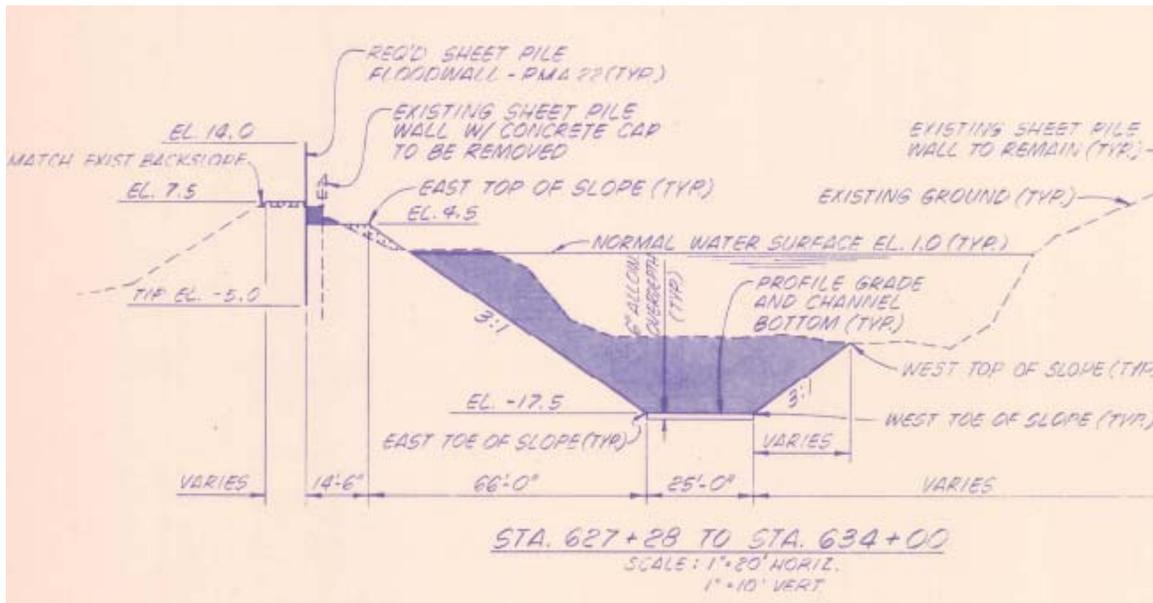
Typical section depicting “normal water surface” in 17th Street Canal at 1.0 ft elevation (Orleans Levee District Contract 02043-0489--1990-As-Built).
